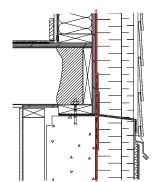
Above-grade to below-grade exterior air barrier red line detail (annotations not shown).
